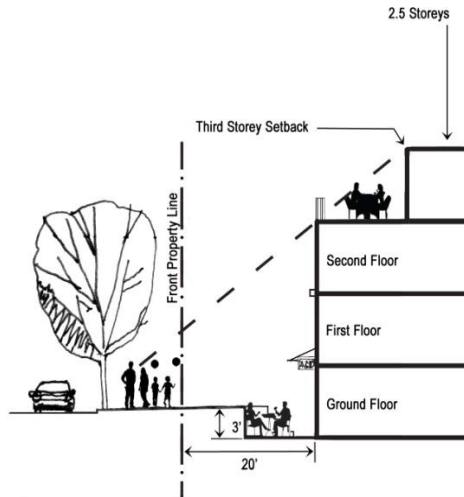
Illustration of upper floor setback for flat or shallow pitched roofs
